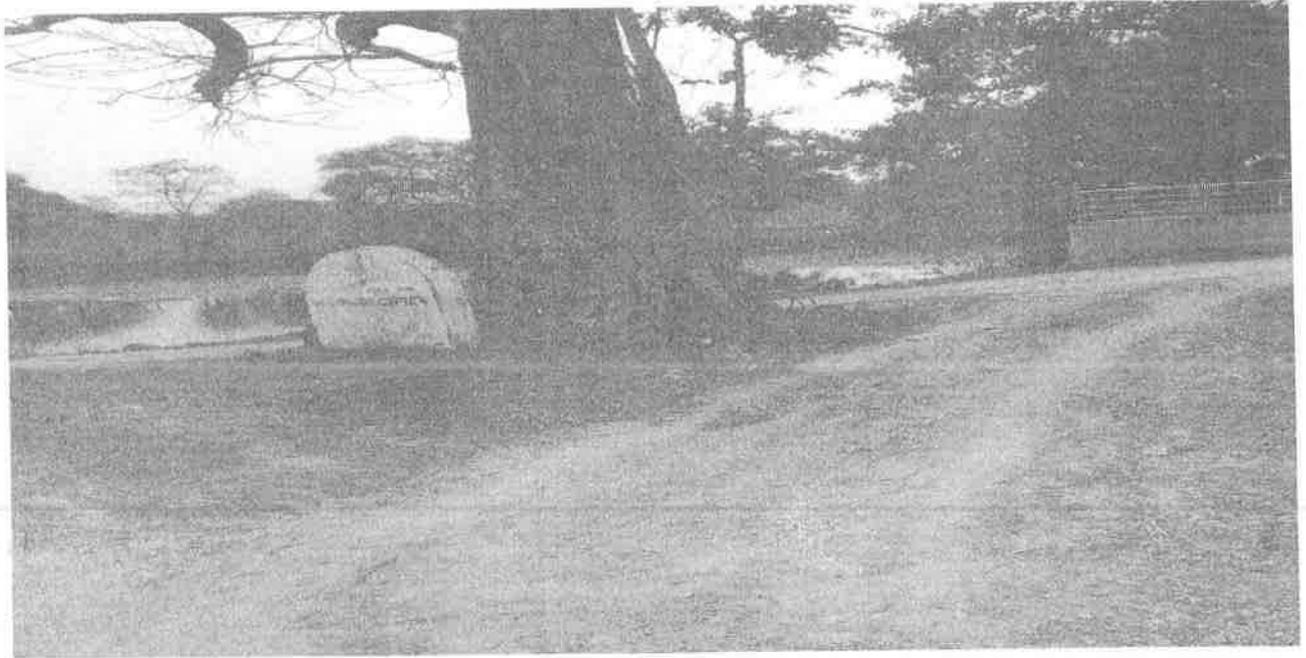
03 Hume pipe provided at Rampur in bhadri pond & 2 hume pipe provided at Tundri for water filling in bandhawa pond at Tundri.
